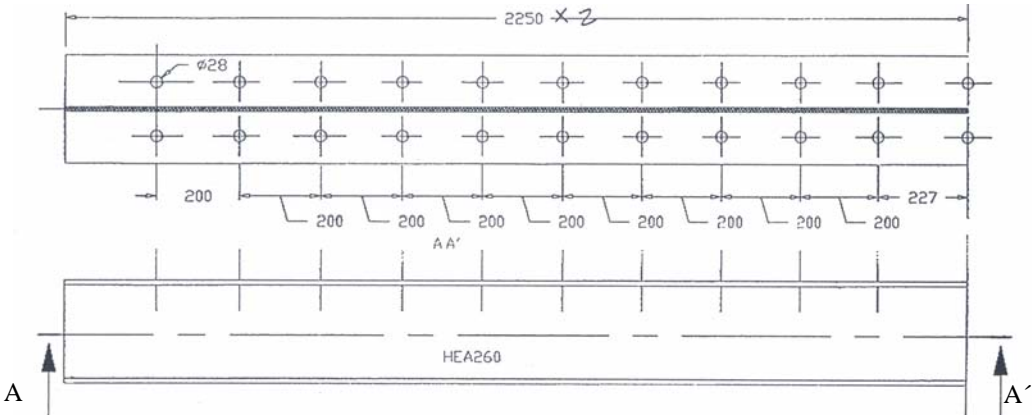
K-bracing and shear-link: detail of Pos. 8
